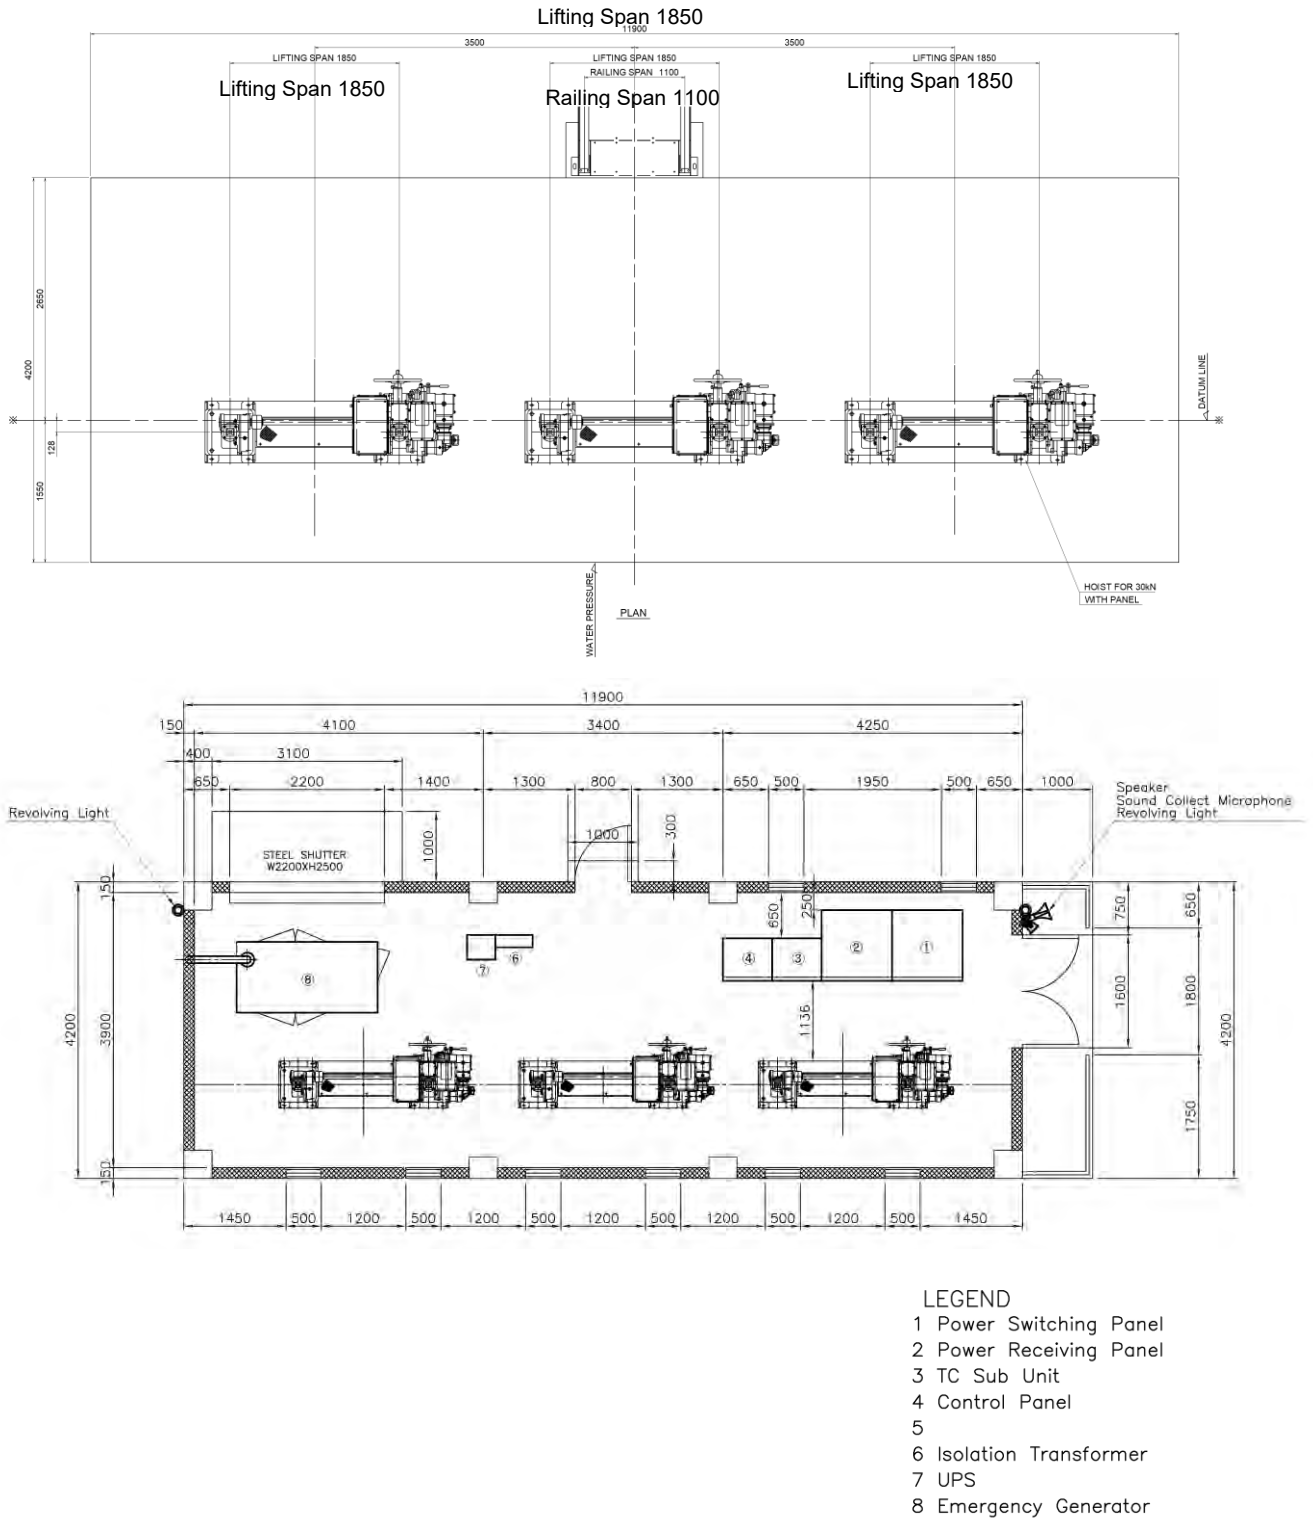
Clearance between the Edge of Hoist and Wall
